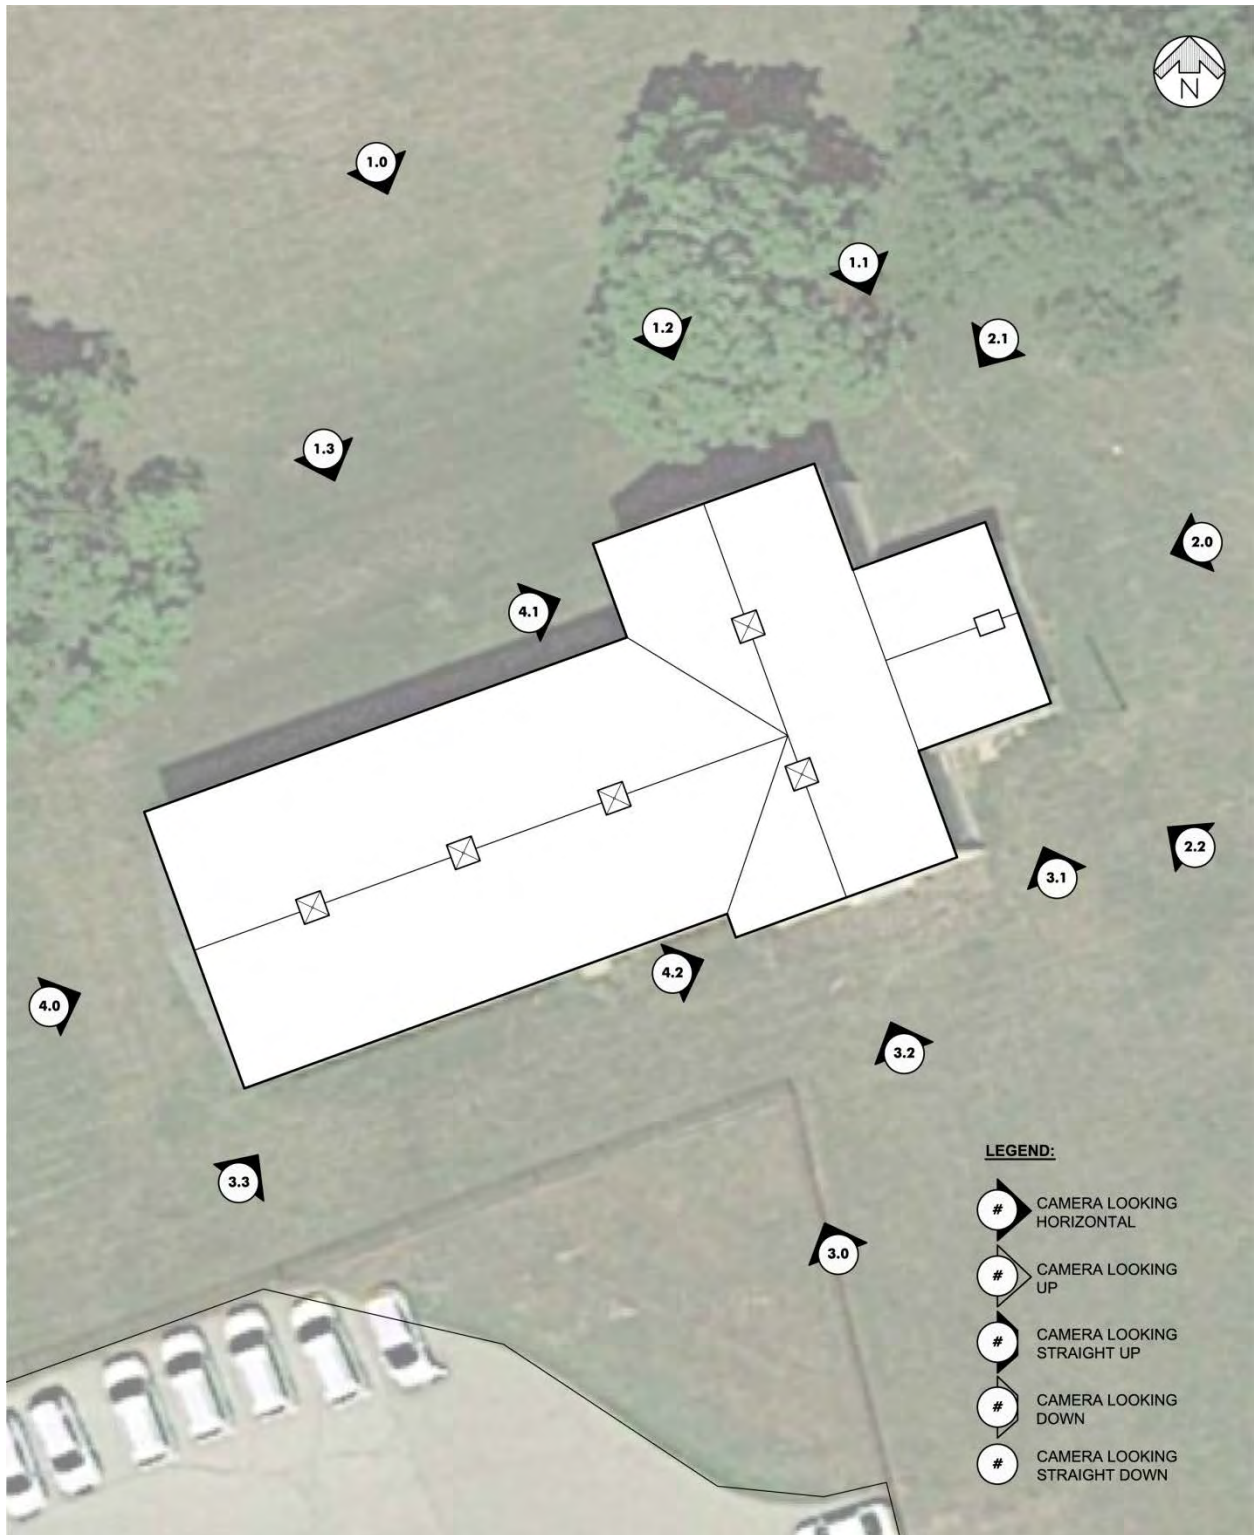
Photo No. 1.0 – 4.3 (Elevations)
